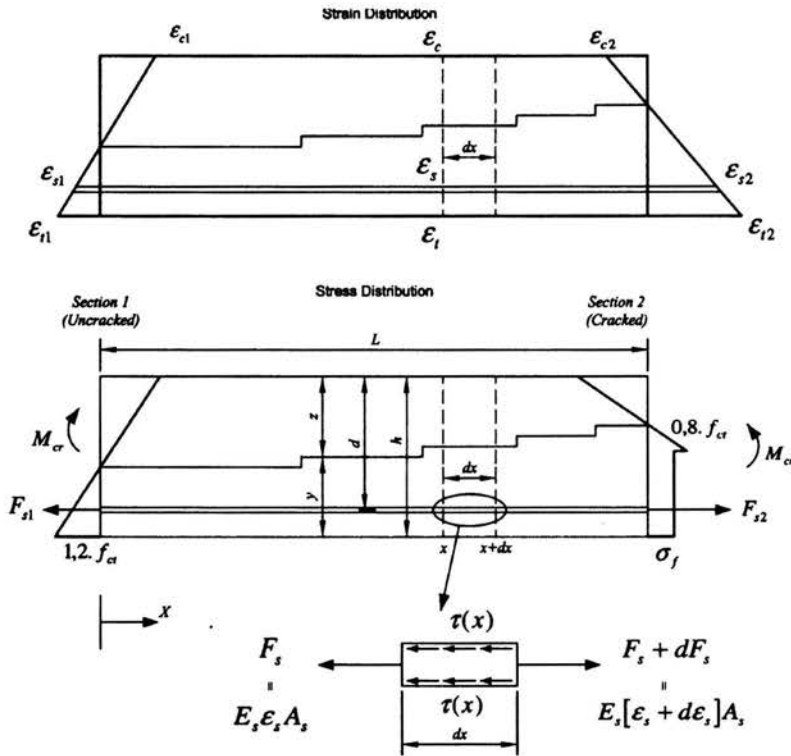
Beam part between a cracked section and a section that has just reached the point of cracking.
